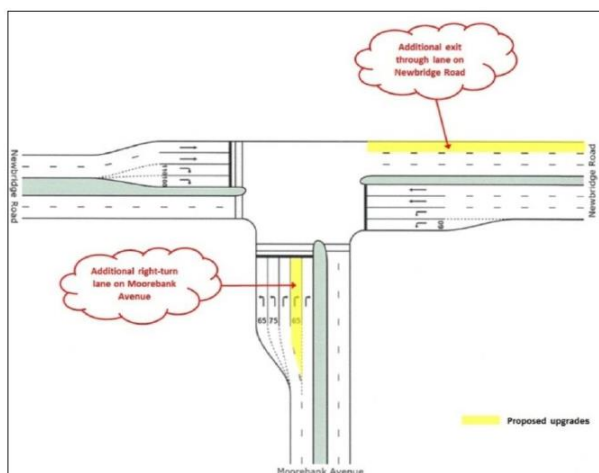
Indicative Upgrades at the Moorebank Avenue/Newbridge Road intersection
